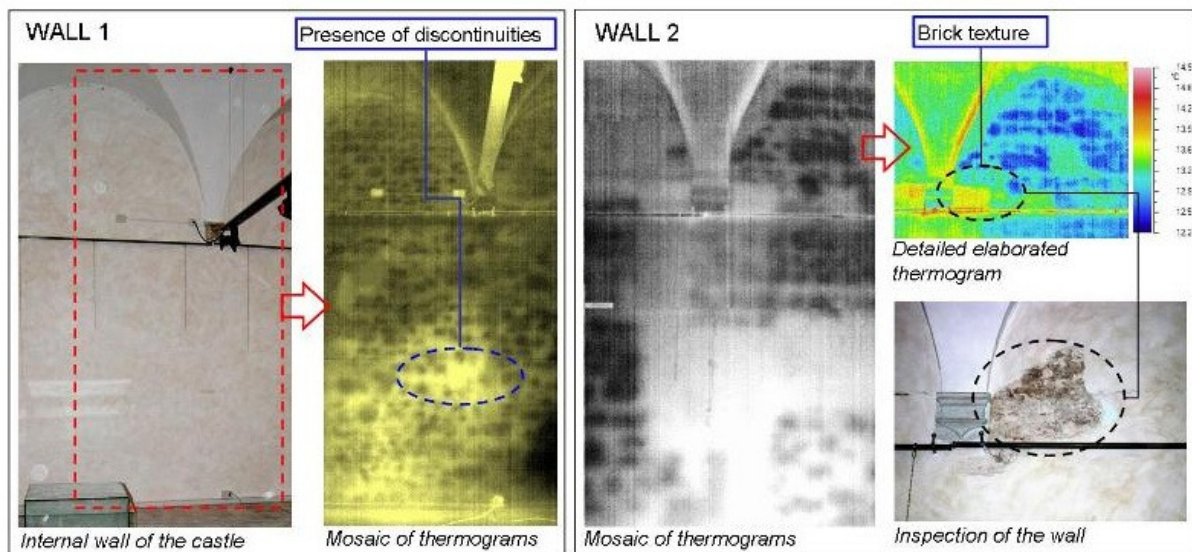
Texture of two masonry walls inside the Castle of L'Aquila.
